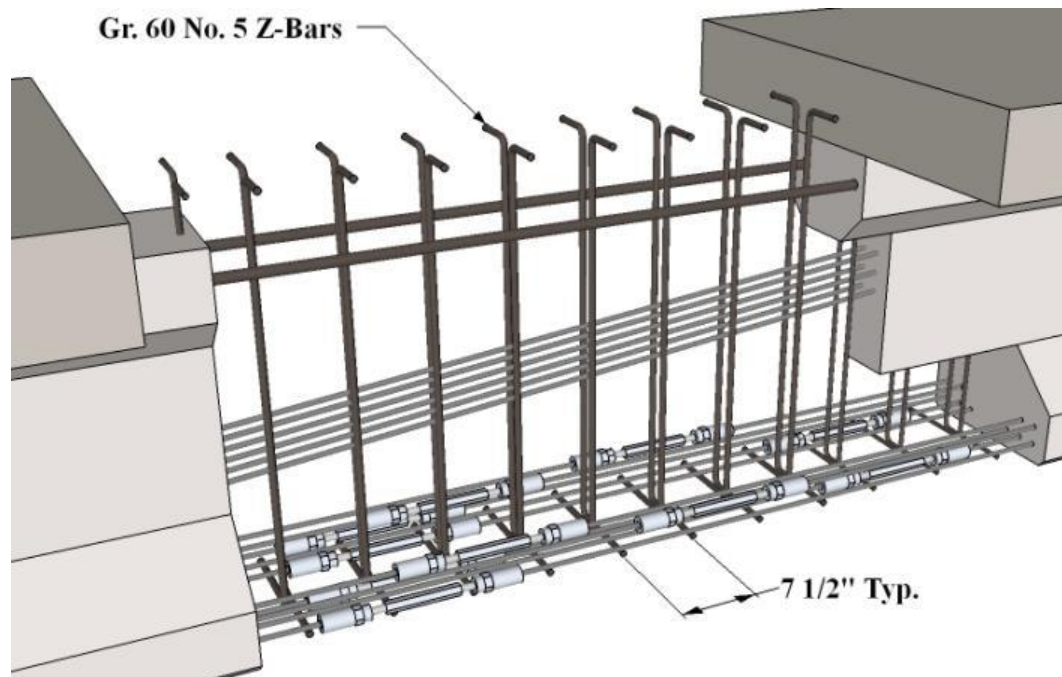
Original Deck Reinforcement with Partial Concrete Demo
